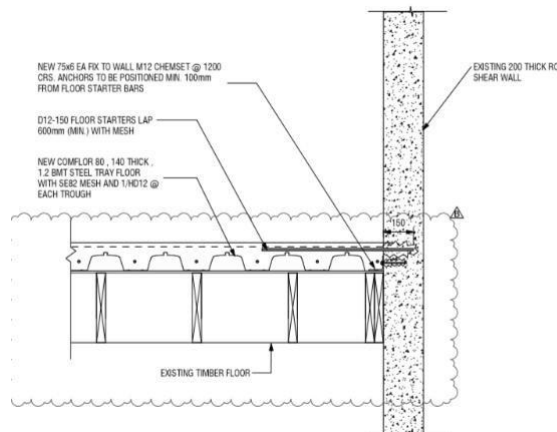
Detail of the proposed light-weight composite floor above the existing timber floor
